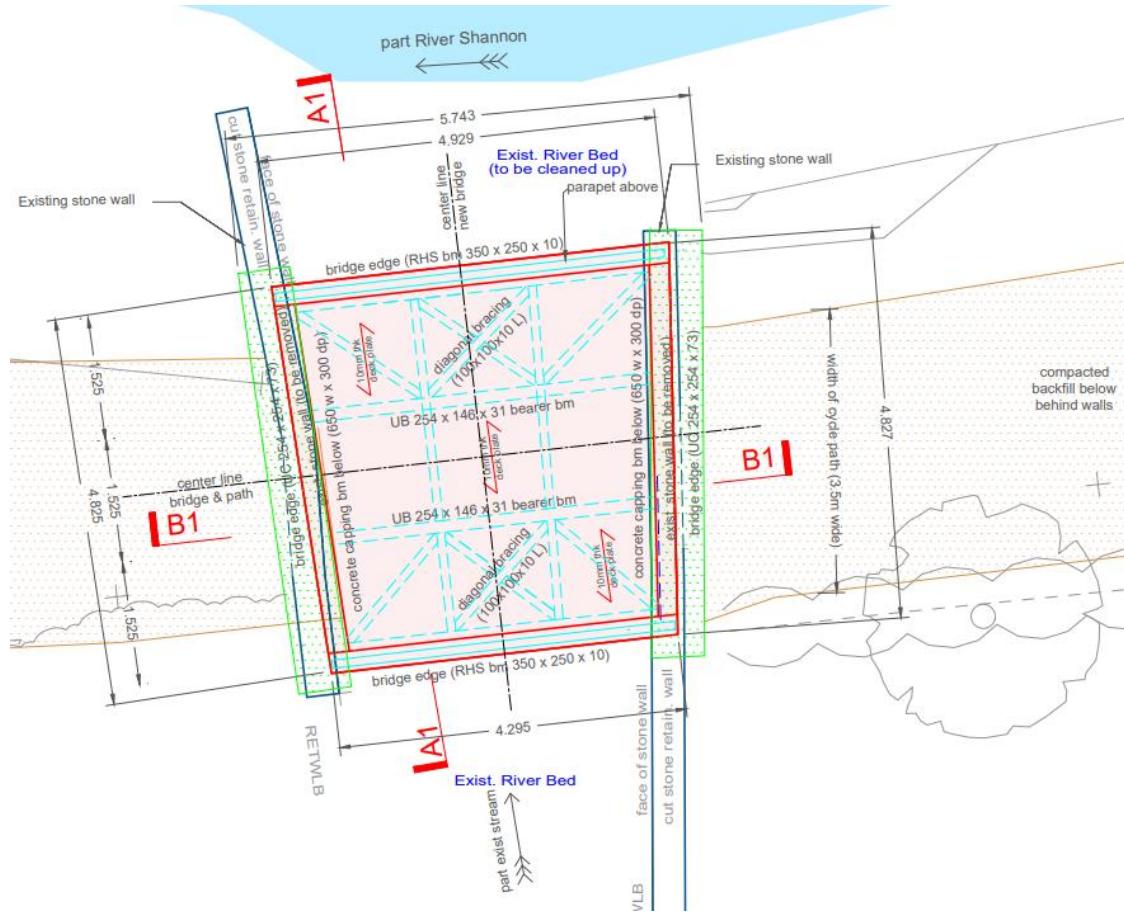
Proposed plan of Bridge 4 deck replacement
